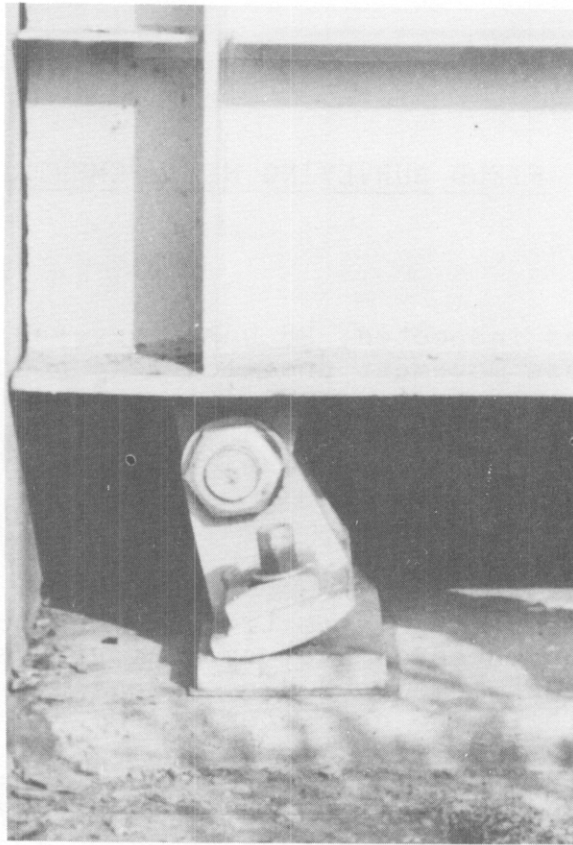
Bridge Girder Jammed Against Abutment and Excessive Rocker Tilt
